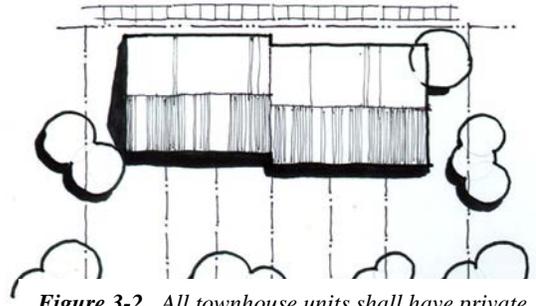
All townhouse units shall have private yard areas of at least 400 square feet.
